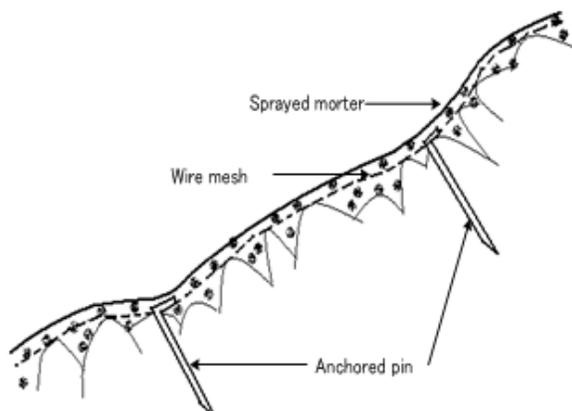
Cross-sectional view of composite and the anchored pin used for slope protection work.
